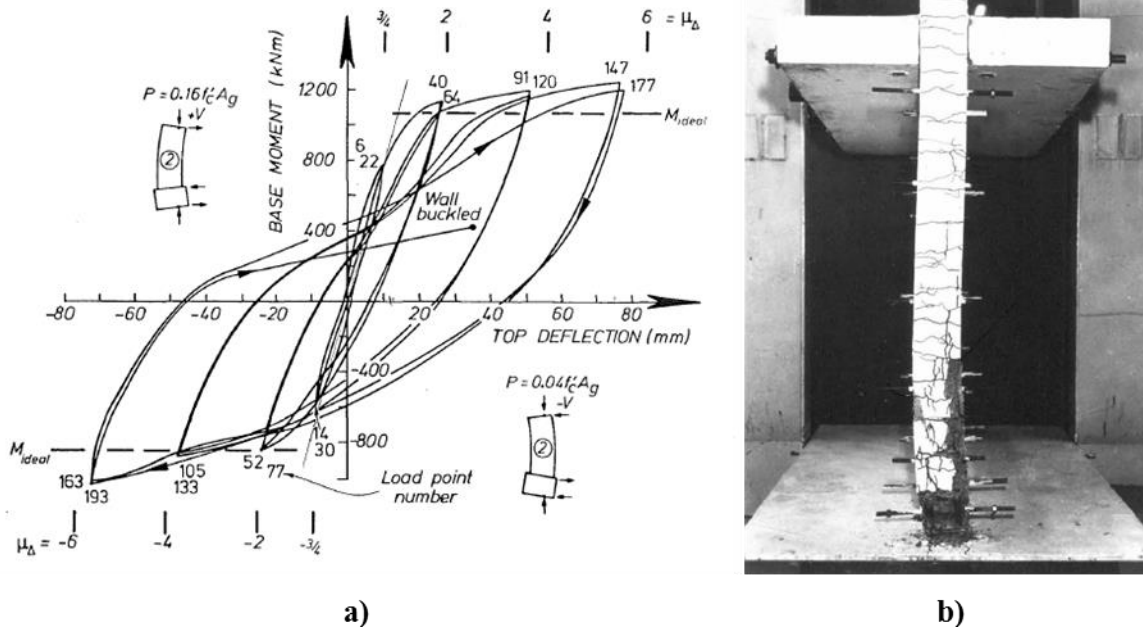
Wall 2 – a) Base moment vs. drift at top of wall, and b) Buckling of wall
